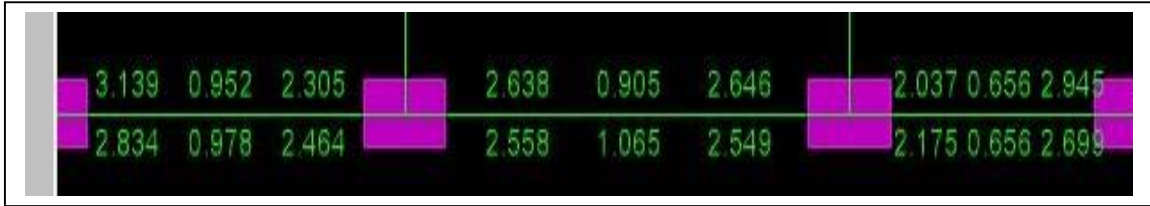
Steel Area of 1st Floor Beam Y-axis
